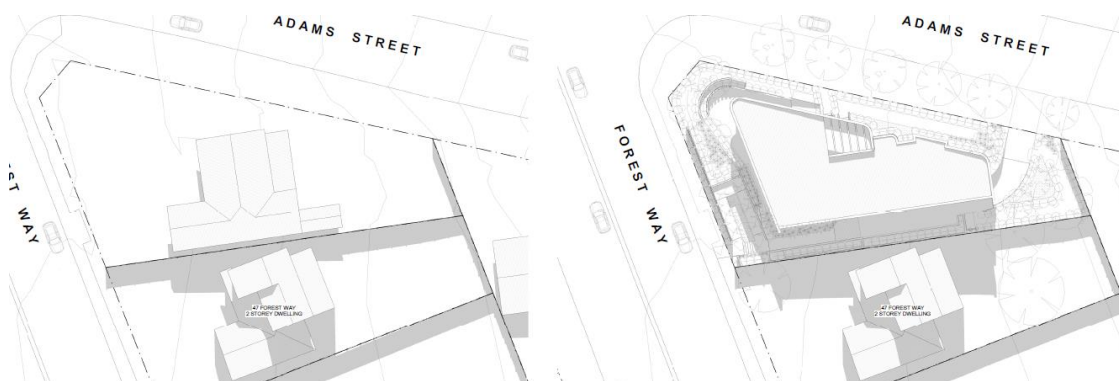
the existing and proposed shading impact to the southern adjoining development at 12pm
